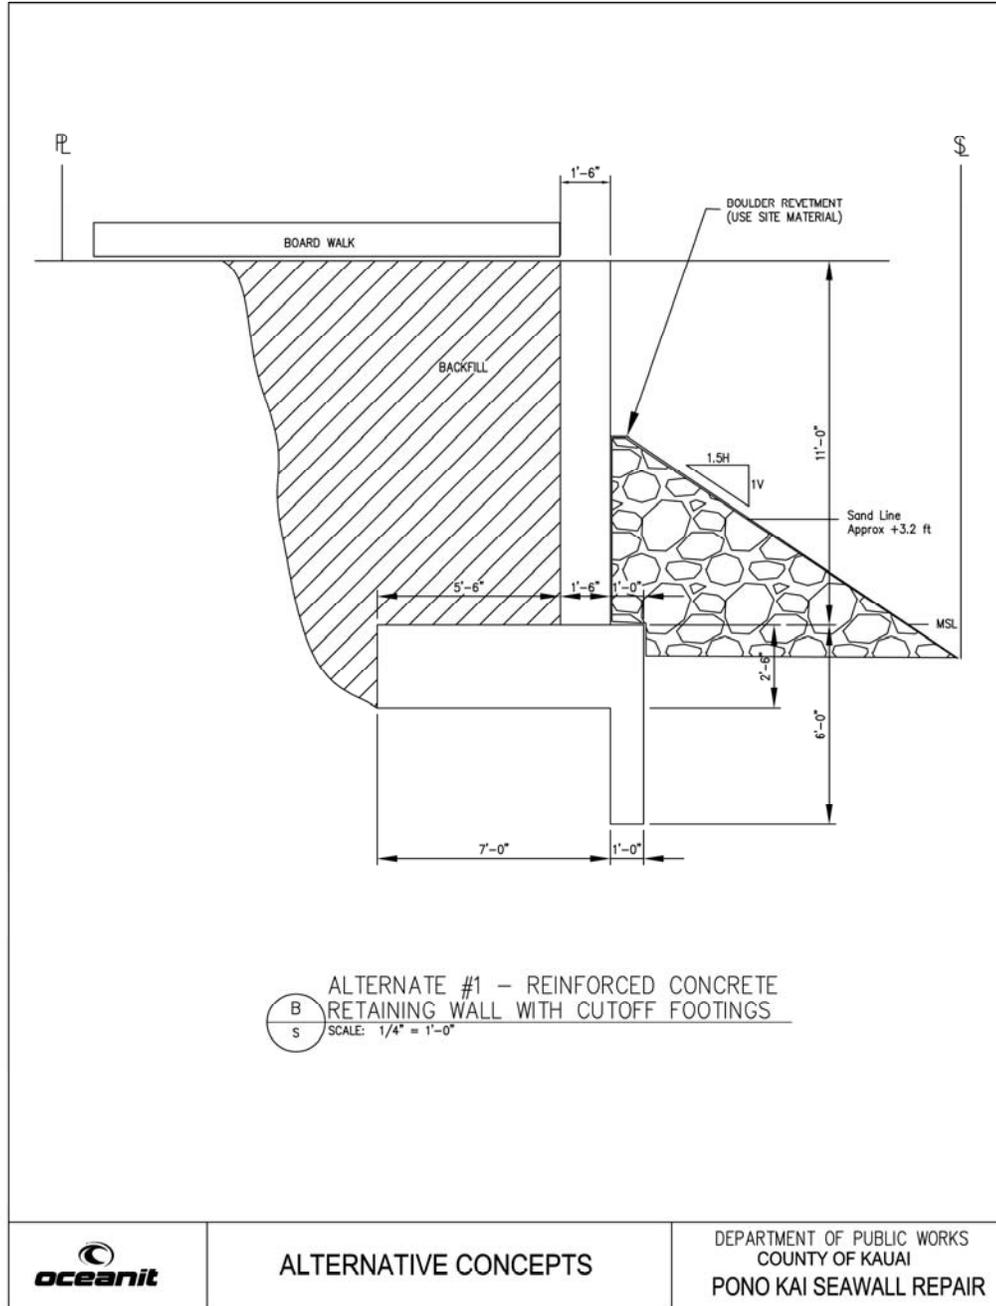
Reinforced Concrete Retaining Wall with Cutoff Footings
